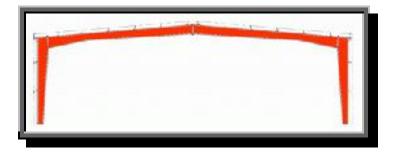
Typical Rigid Frame Pre-Engineered Building (Rigid Building Systems, 2005)
